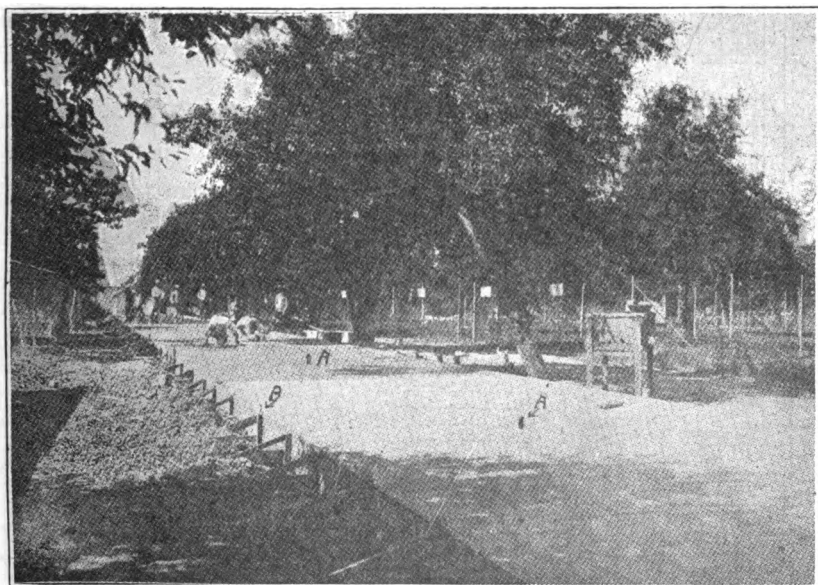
Completing the floor of a 100-ft. fool-proof laying house. A shows the water pipes. B shows the bolts placed in the concrete foundation to bolt the sill to the foundation.
